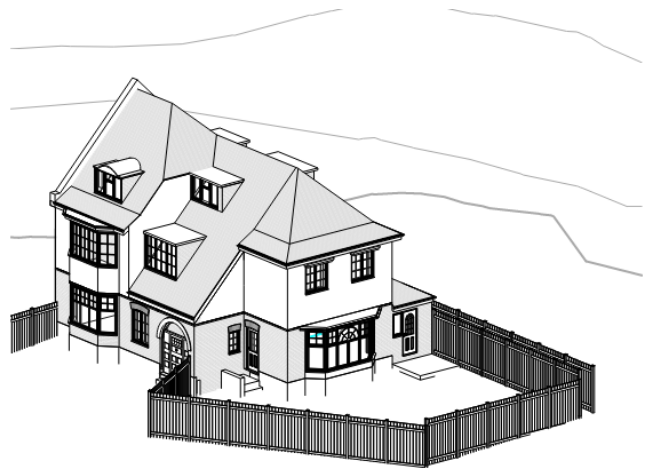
(above): Street view – Ferncroft Avenue elevation (source: Google 3D)
